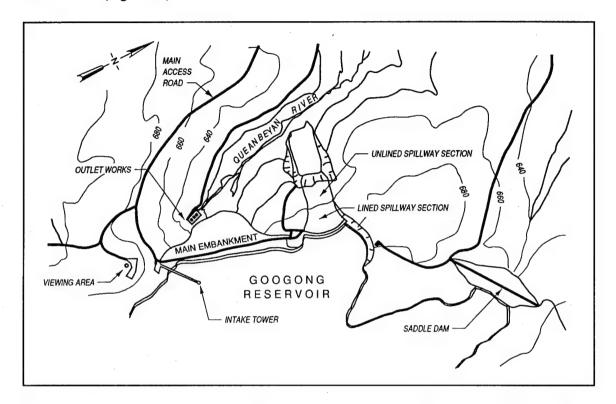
Layout of dam and appurtenant structures, Googong Dam (from ACT Electricity and Water 1991a)
